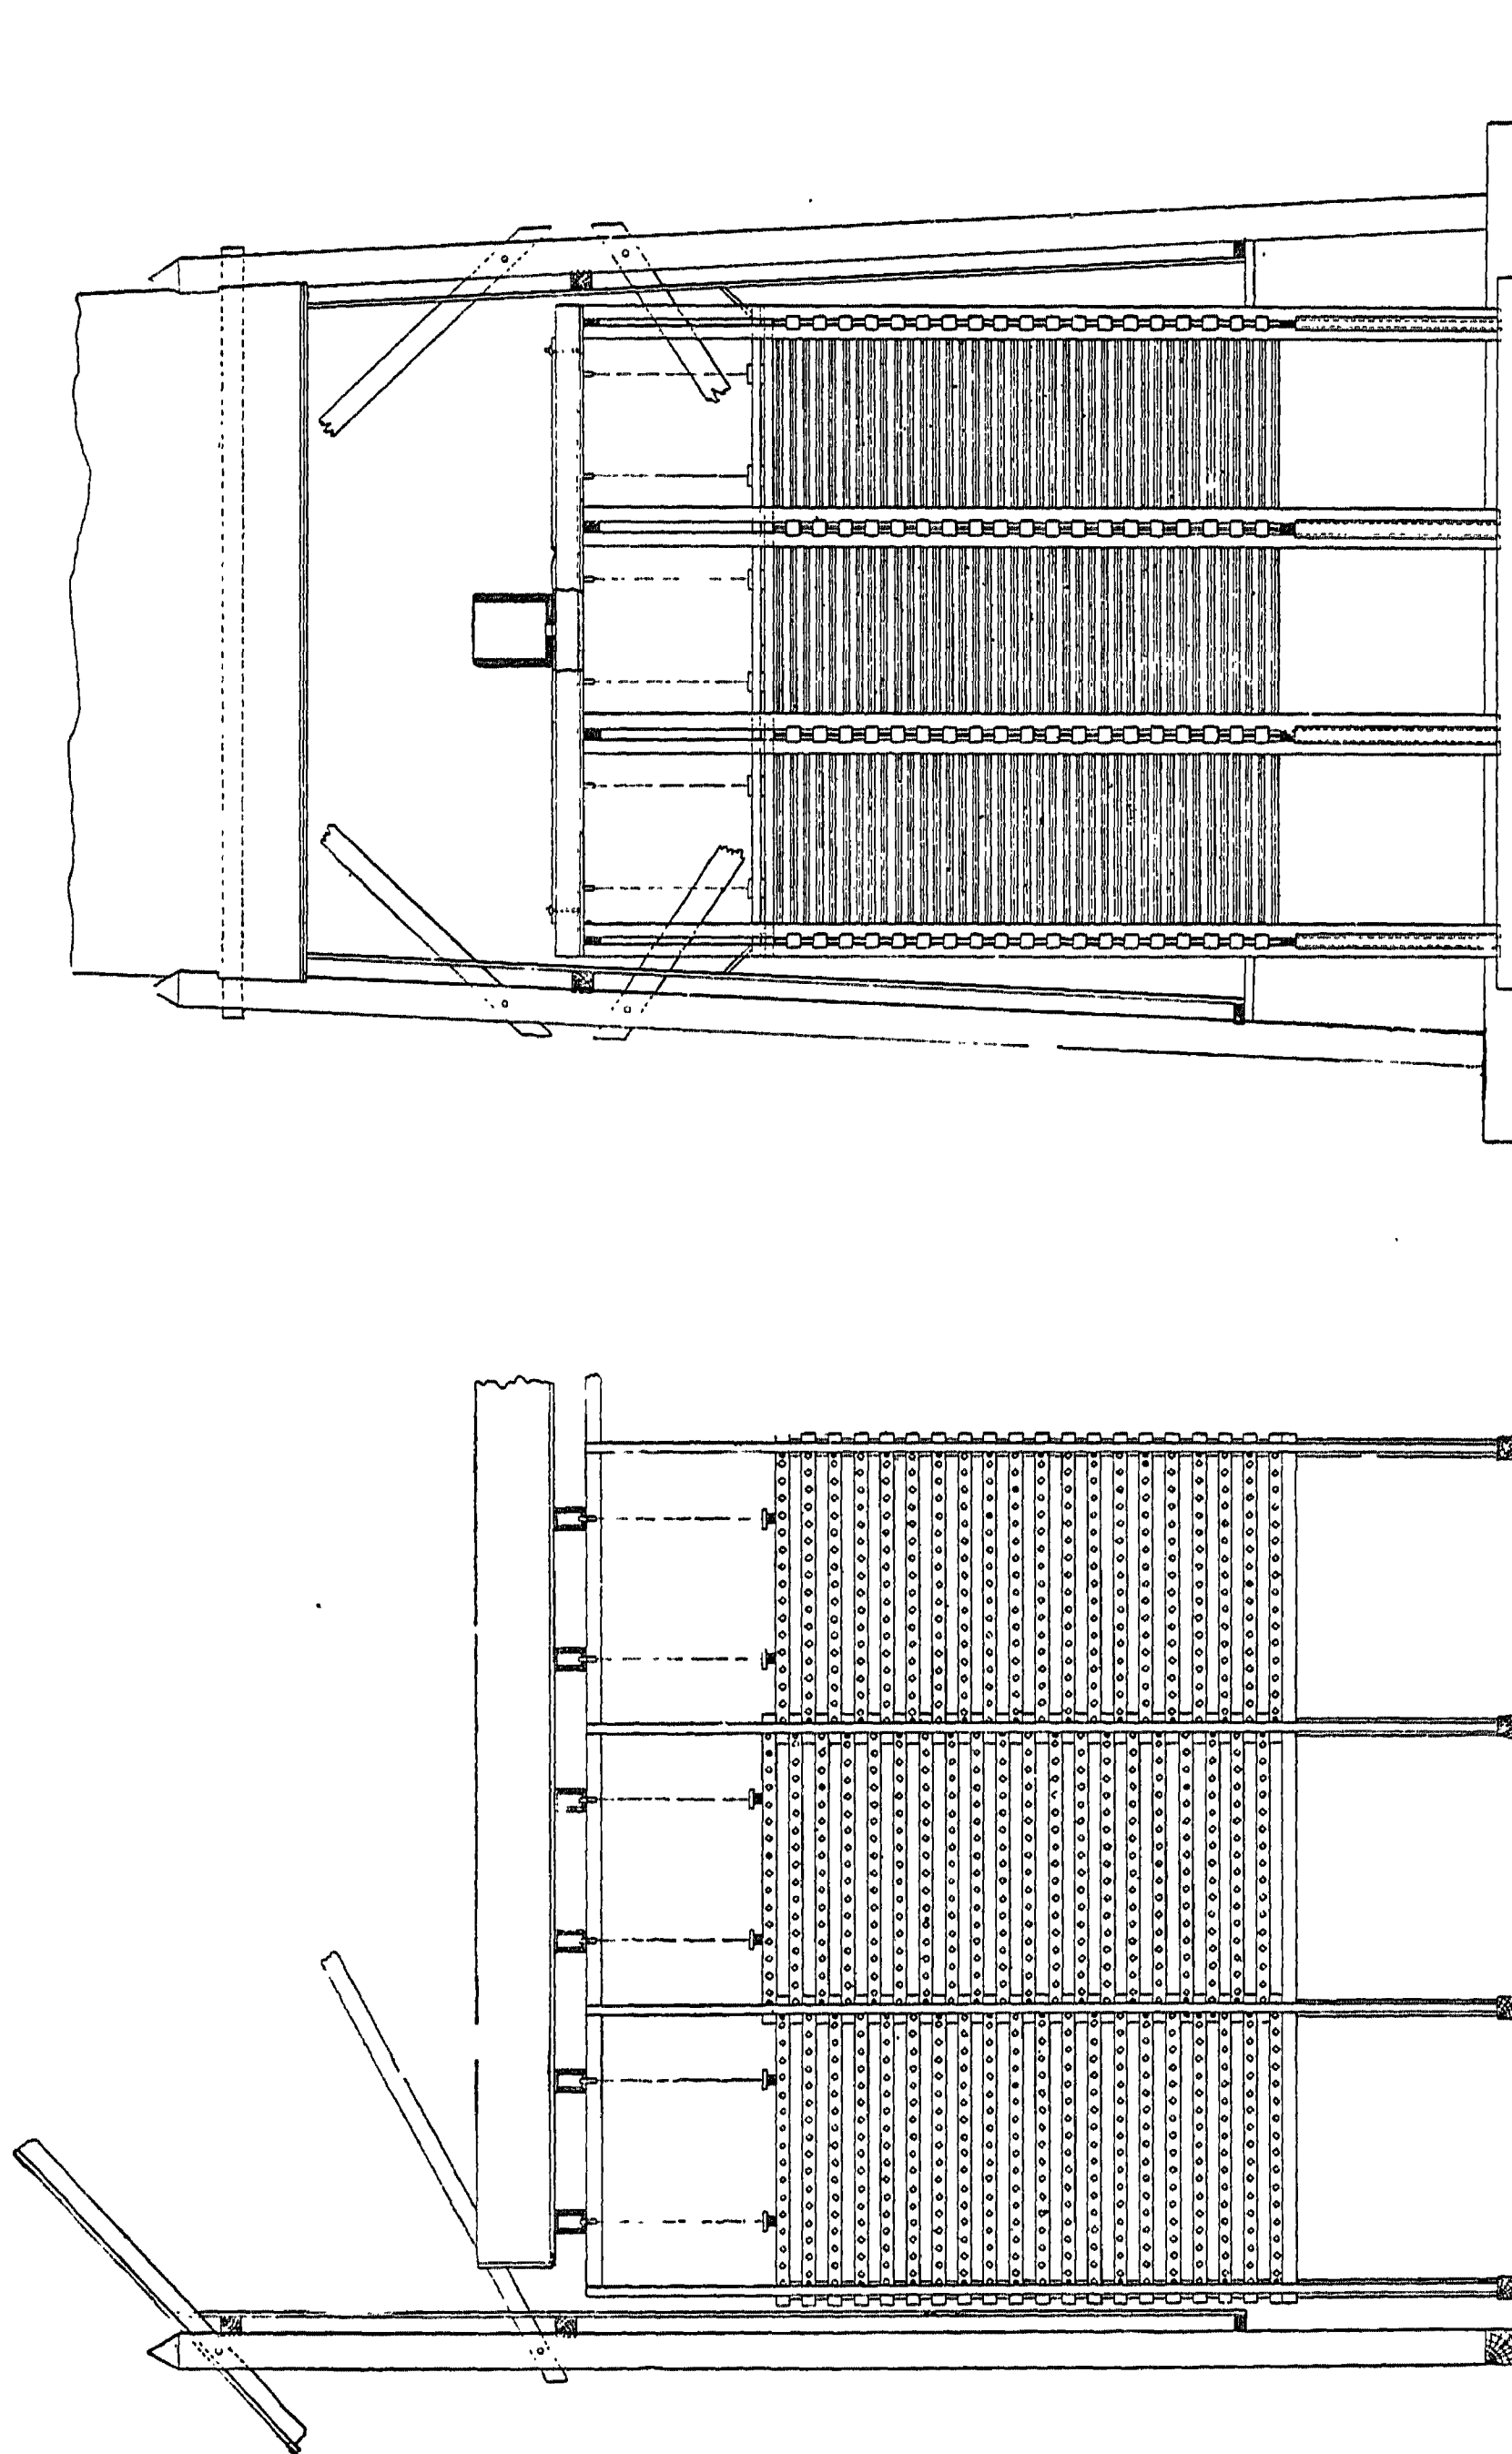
Arrangement of Splashbars in Cooling Tower by the Davenport Engineering Company
